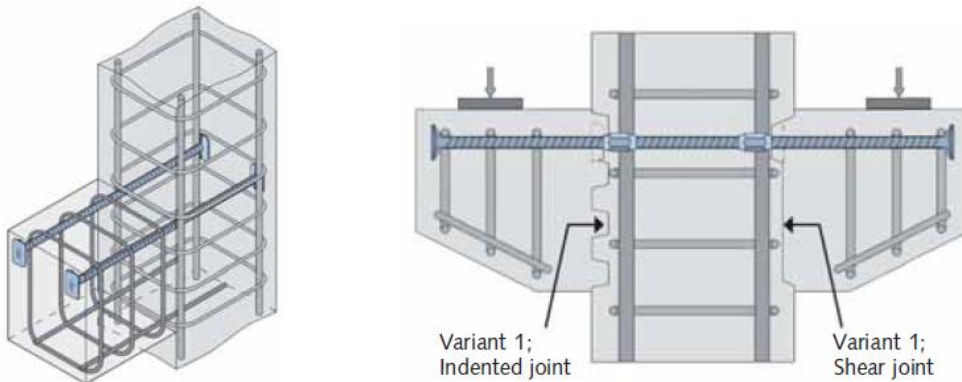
Type 1 stud connectors in reinforced concrete corbels
